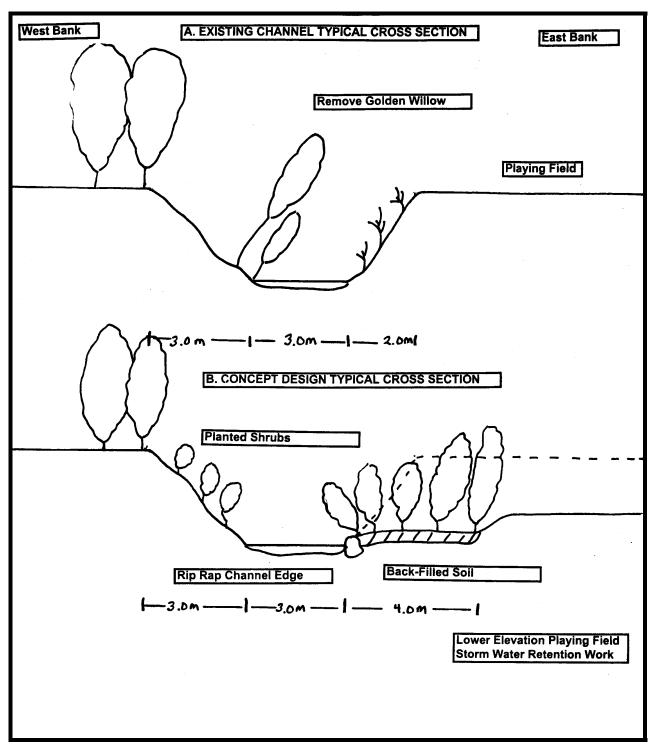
Typical cross section of Bowker Creek in Zone 2 showing concept design for proposed bank reconstruction and riparian restoration work
